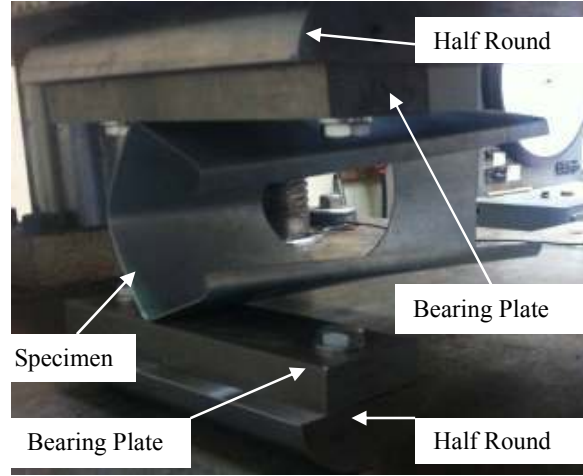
Schematic view End-Two-Flange loading test arrangement (End view)
